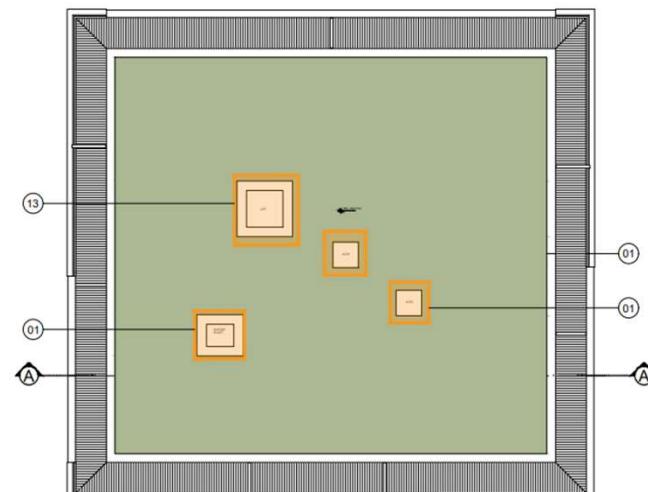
Existing Seventh Floor Plan – Extracted from Existing Scheme
